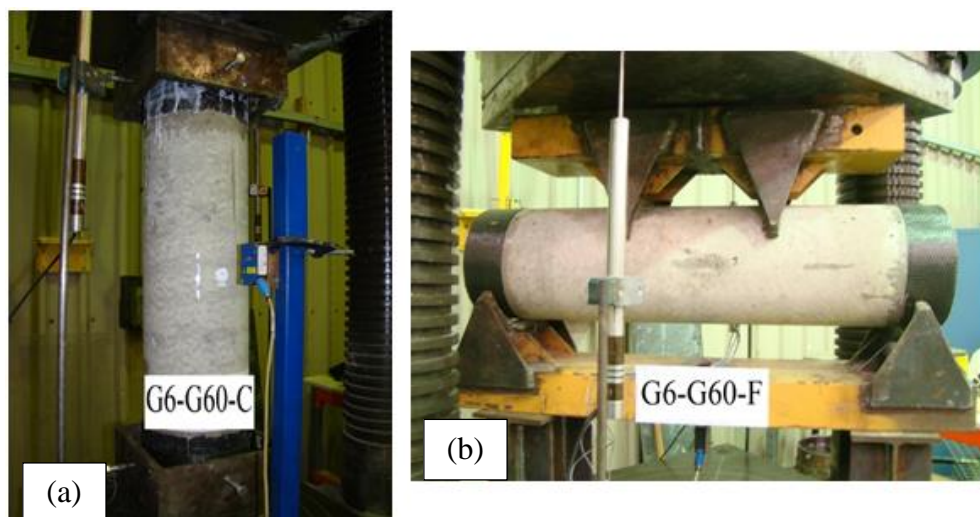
Typical testing set up of the tested specimens: (a) Column specimen; and (b) Beam specimen
